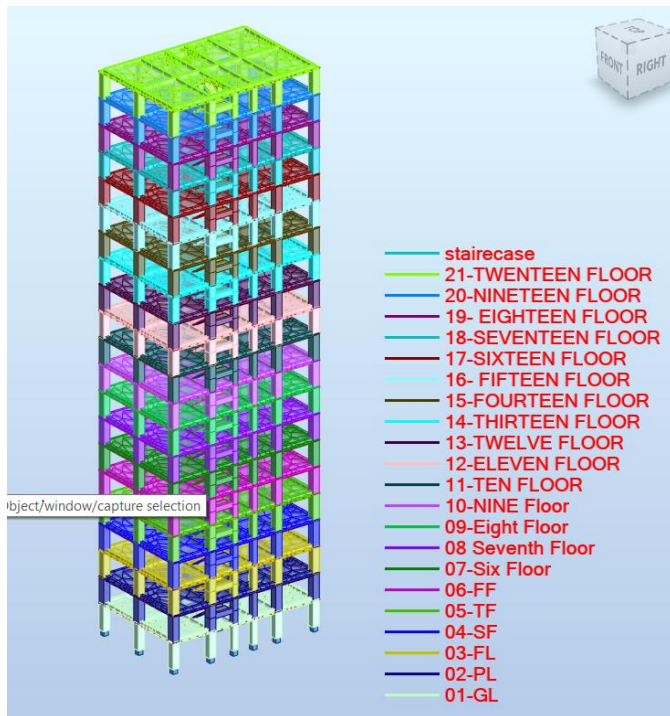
Elevation (3-D View) With-Out Shear Wall At Robot Software
